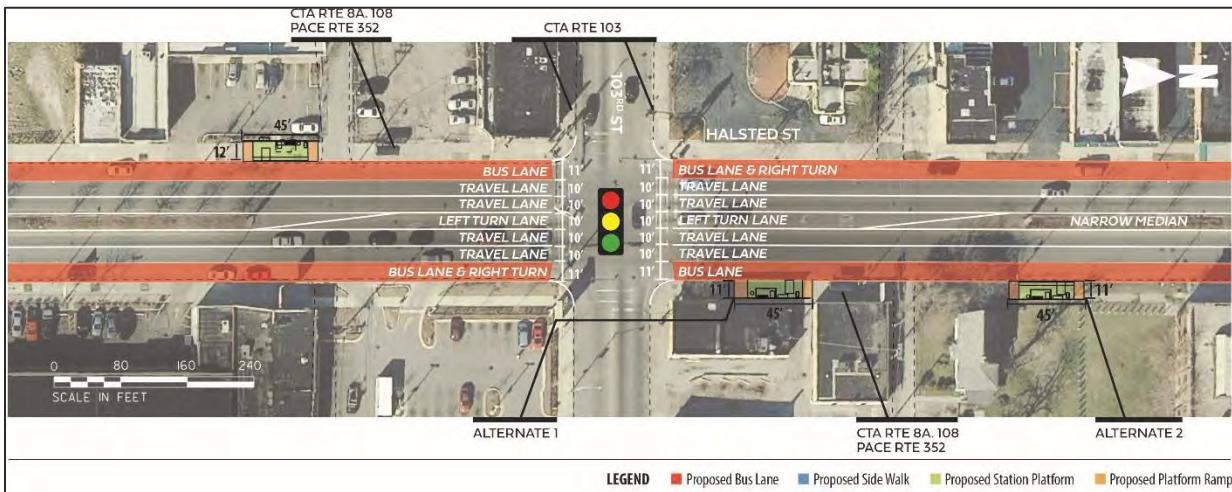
ALTERNATIVE 3 TYPICAL CROSS SECTION
